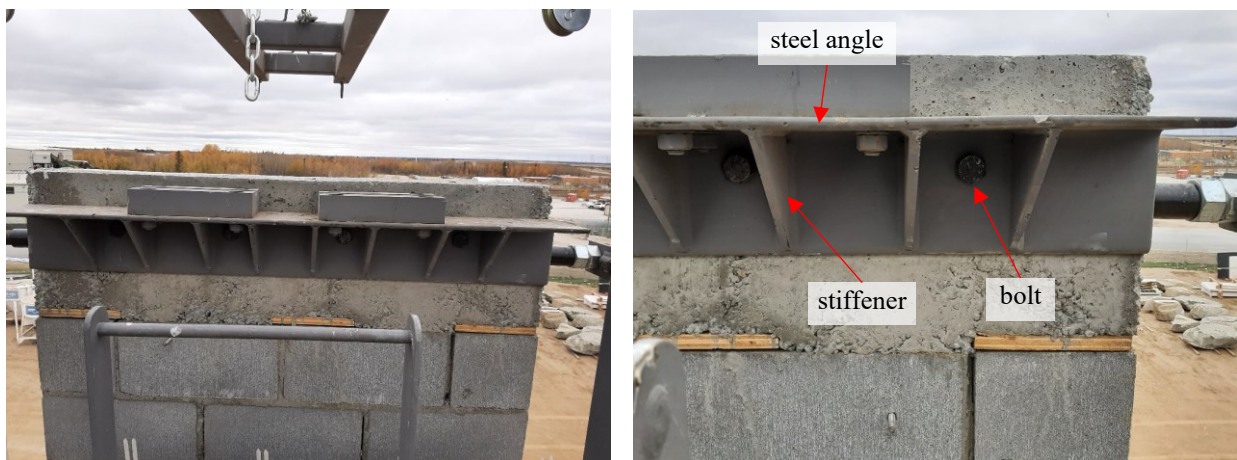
Steel angle connected to the top concrete beam to transmit eccentric vertical loads.
